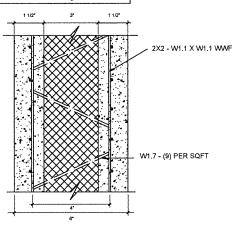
MINIMUM RSG 3-D STRUCTURAL PANEL SECTION
